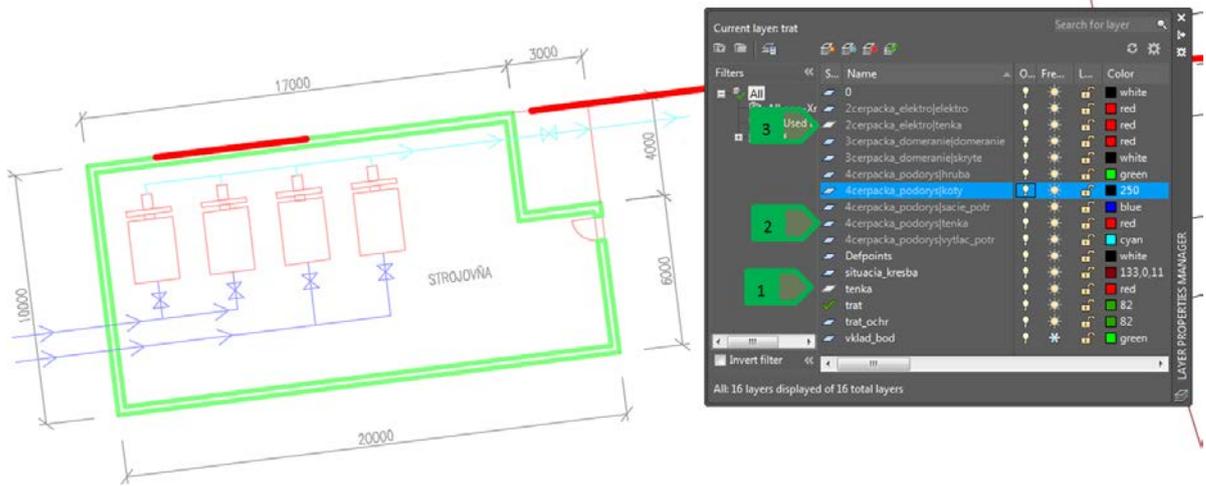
Layers of the external references, 1 – “thin” layer in the target drawing; 2 – “thin” layer in the drawing of the pumping station floor plan; 3 – “thin” layer in the drawing of the route of the electric line
